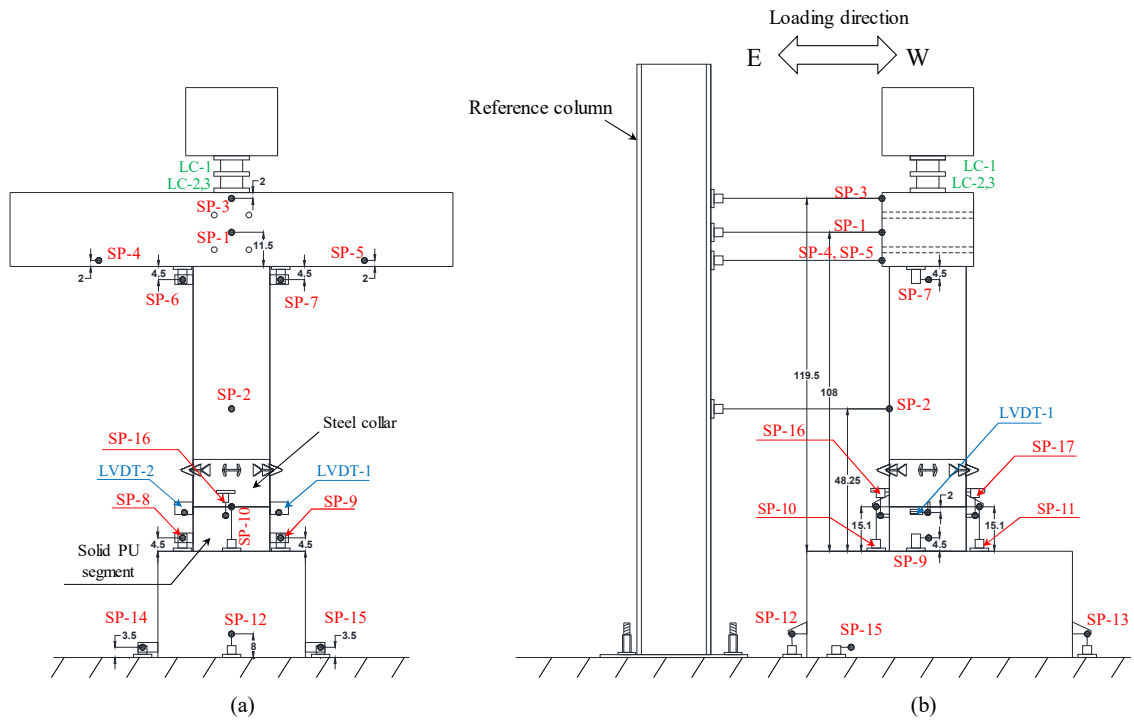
Schematic representation of instrumentation for PU rocking specimen: (a) south-north elevation (looking west); (b) east-west elevation (looking south) (Note: ED links not shown.).
